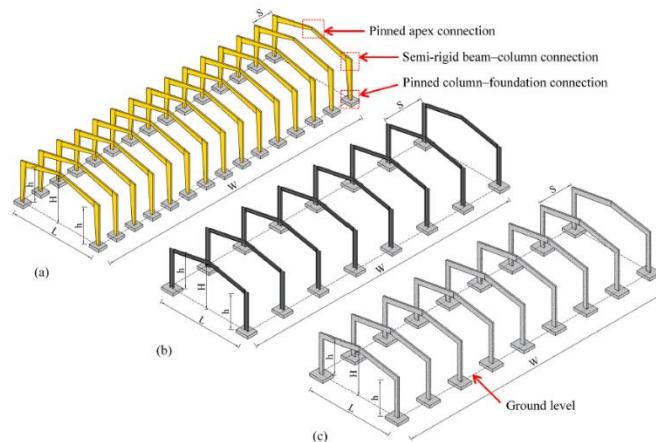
3D drawing of the portal frames: (a) timber frames; (b) steel frames; (c) reinforced concrete frames [6]
